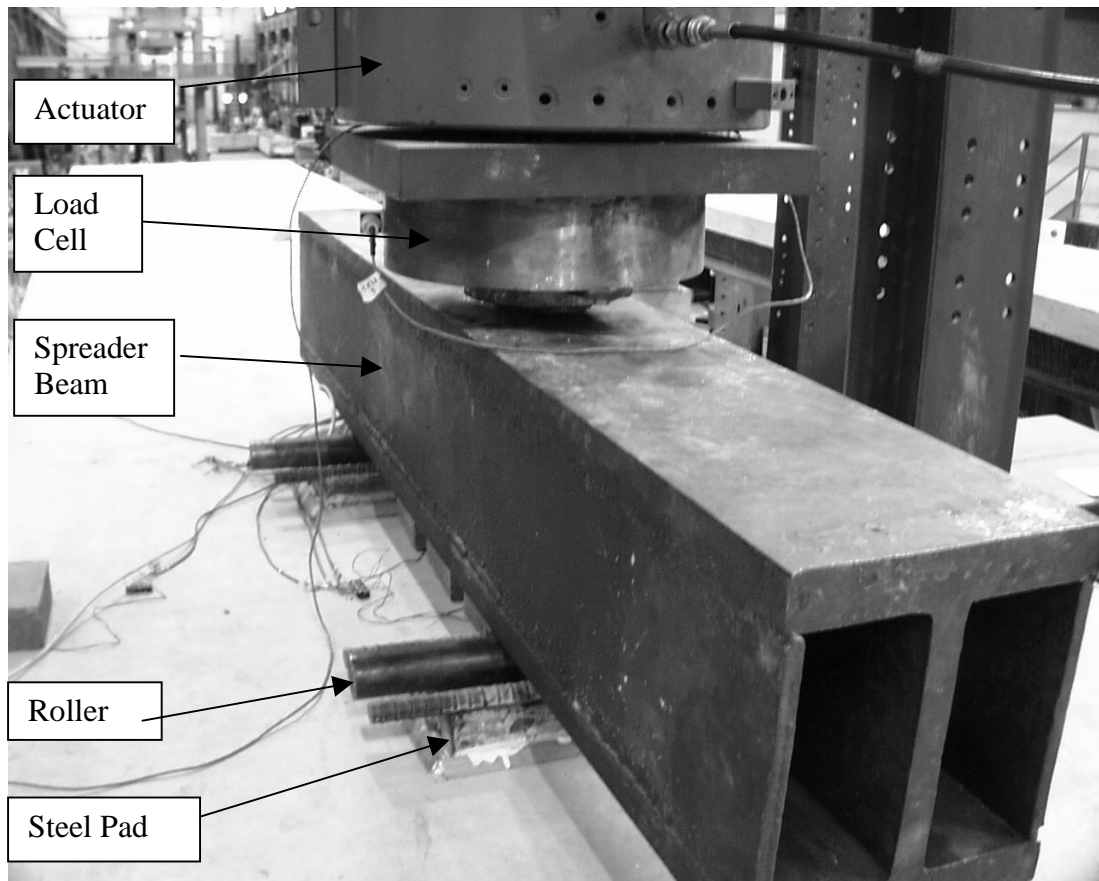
Spreader Beam, Rollers, and Loading Pads
